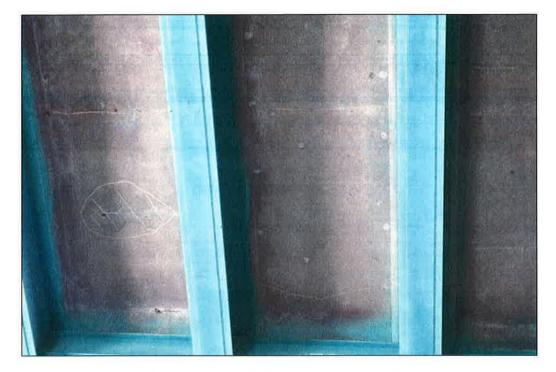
Typical Condition of Soffit (Bent 120-121) (fair condition – stained and unstained cracking, isolated delaminations and spalls, patches and light scaling)
